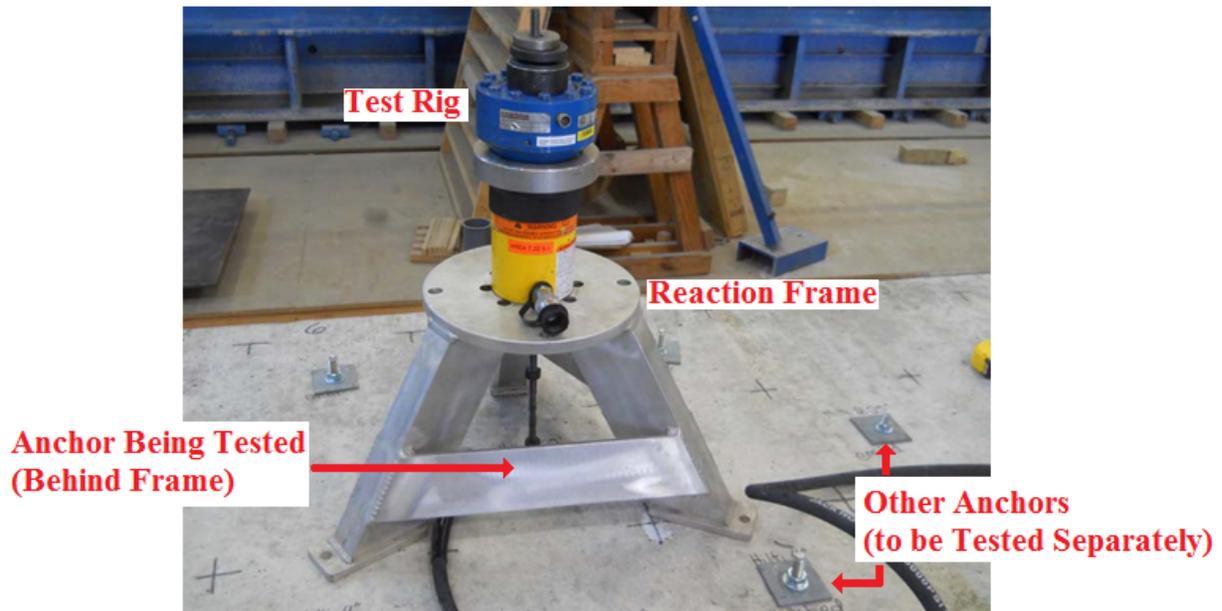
Unconfined Anchor Test Setup for Shallow Anchors
